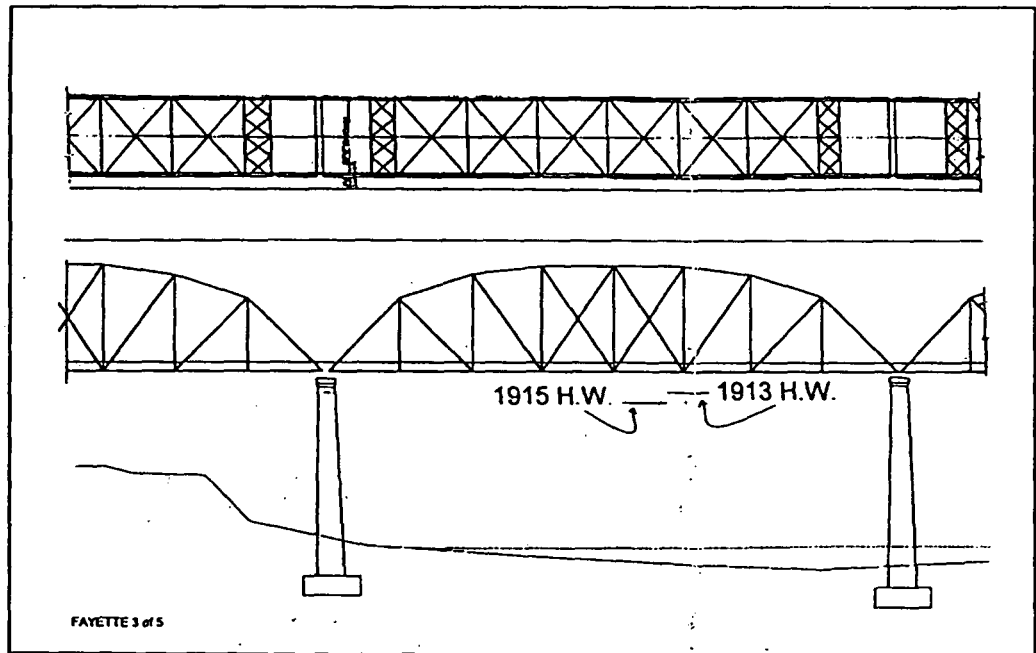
Elevation of the Colorado River bridge as shown in the 1940 plans.
